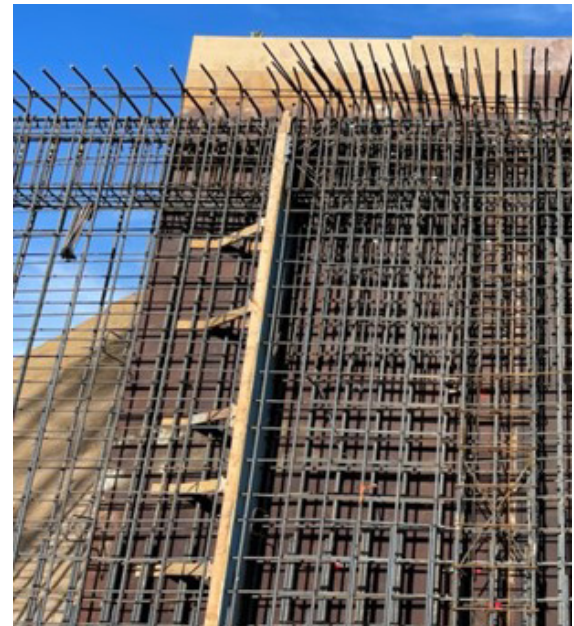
A progress photo showing a wall with two layers of reinforcement penetrating the vertical formwork at a construction joint. Such joints are labor- and time-intensive to form and remove, so contractors seek to minimize such construction joints and reinforcing penetrations to improve constructability. (Image courtesy of Hensel Phelps.)
